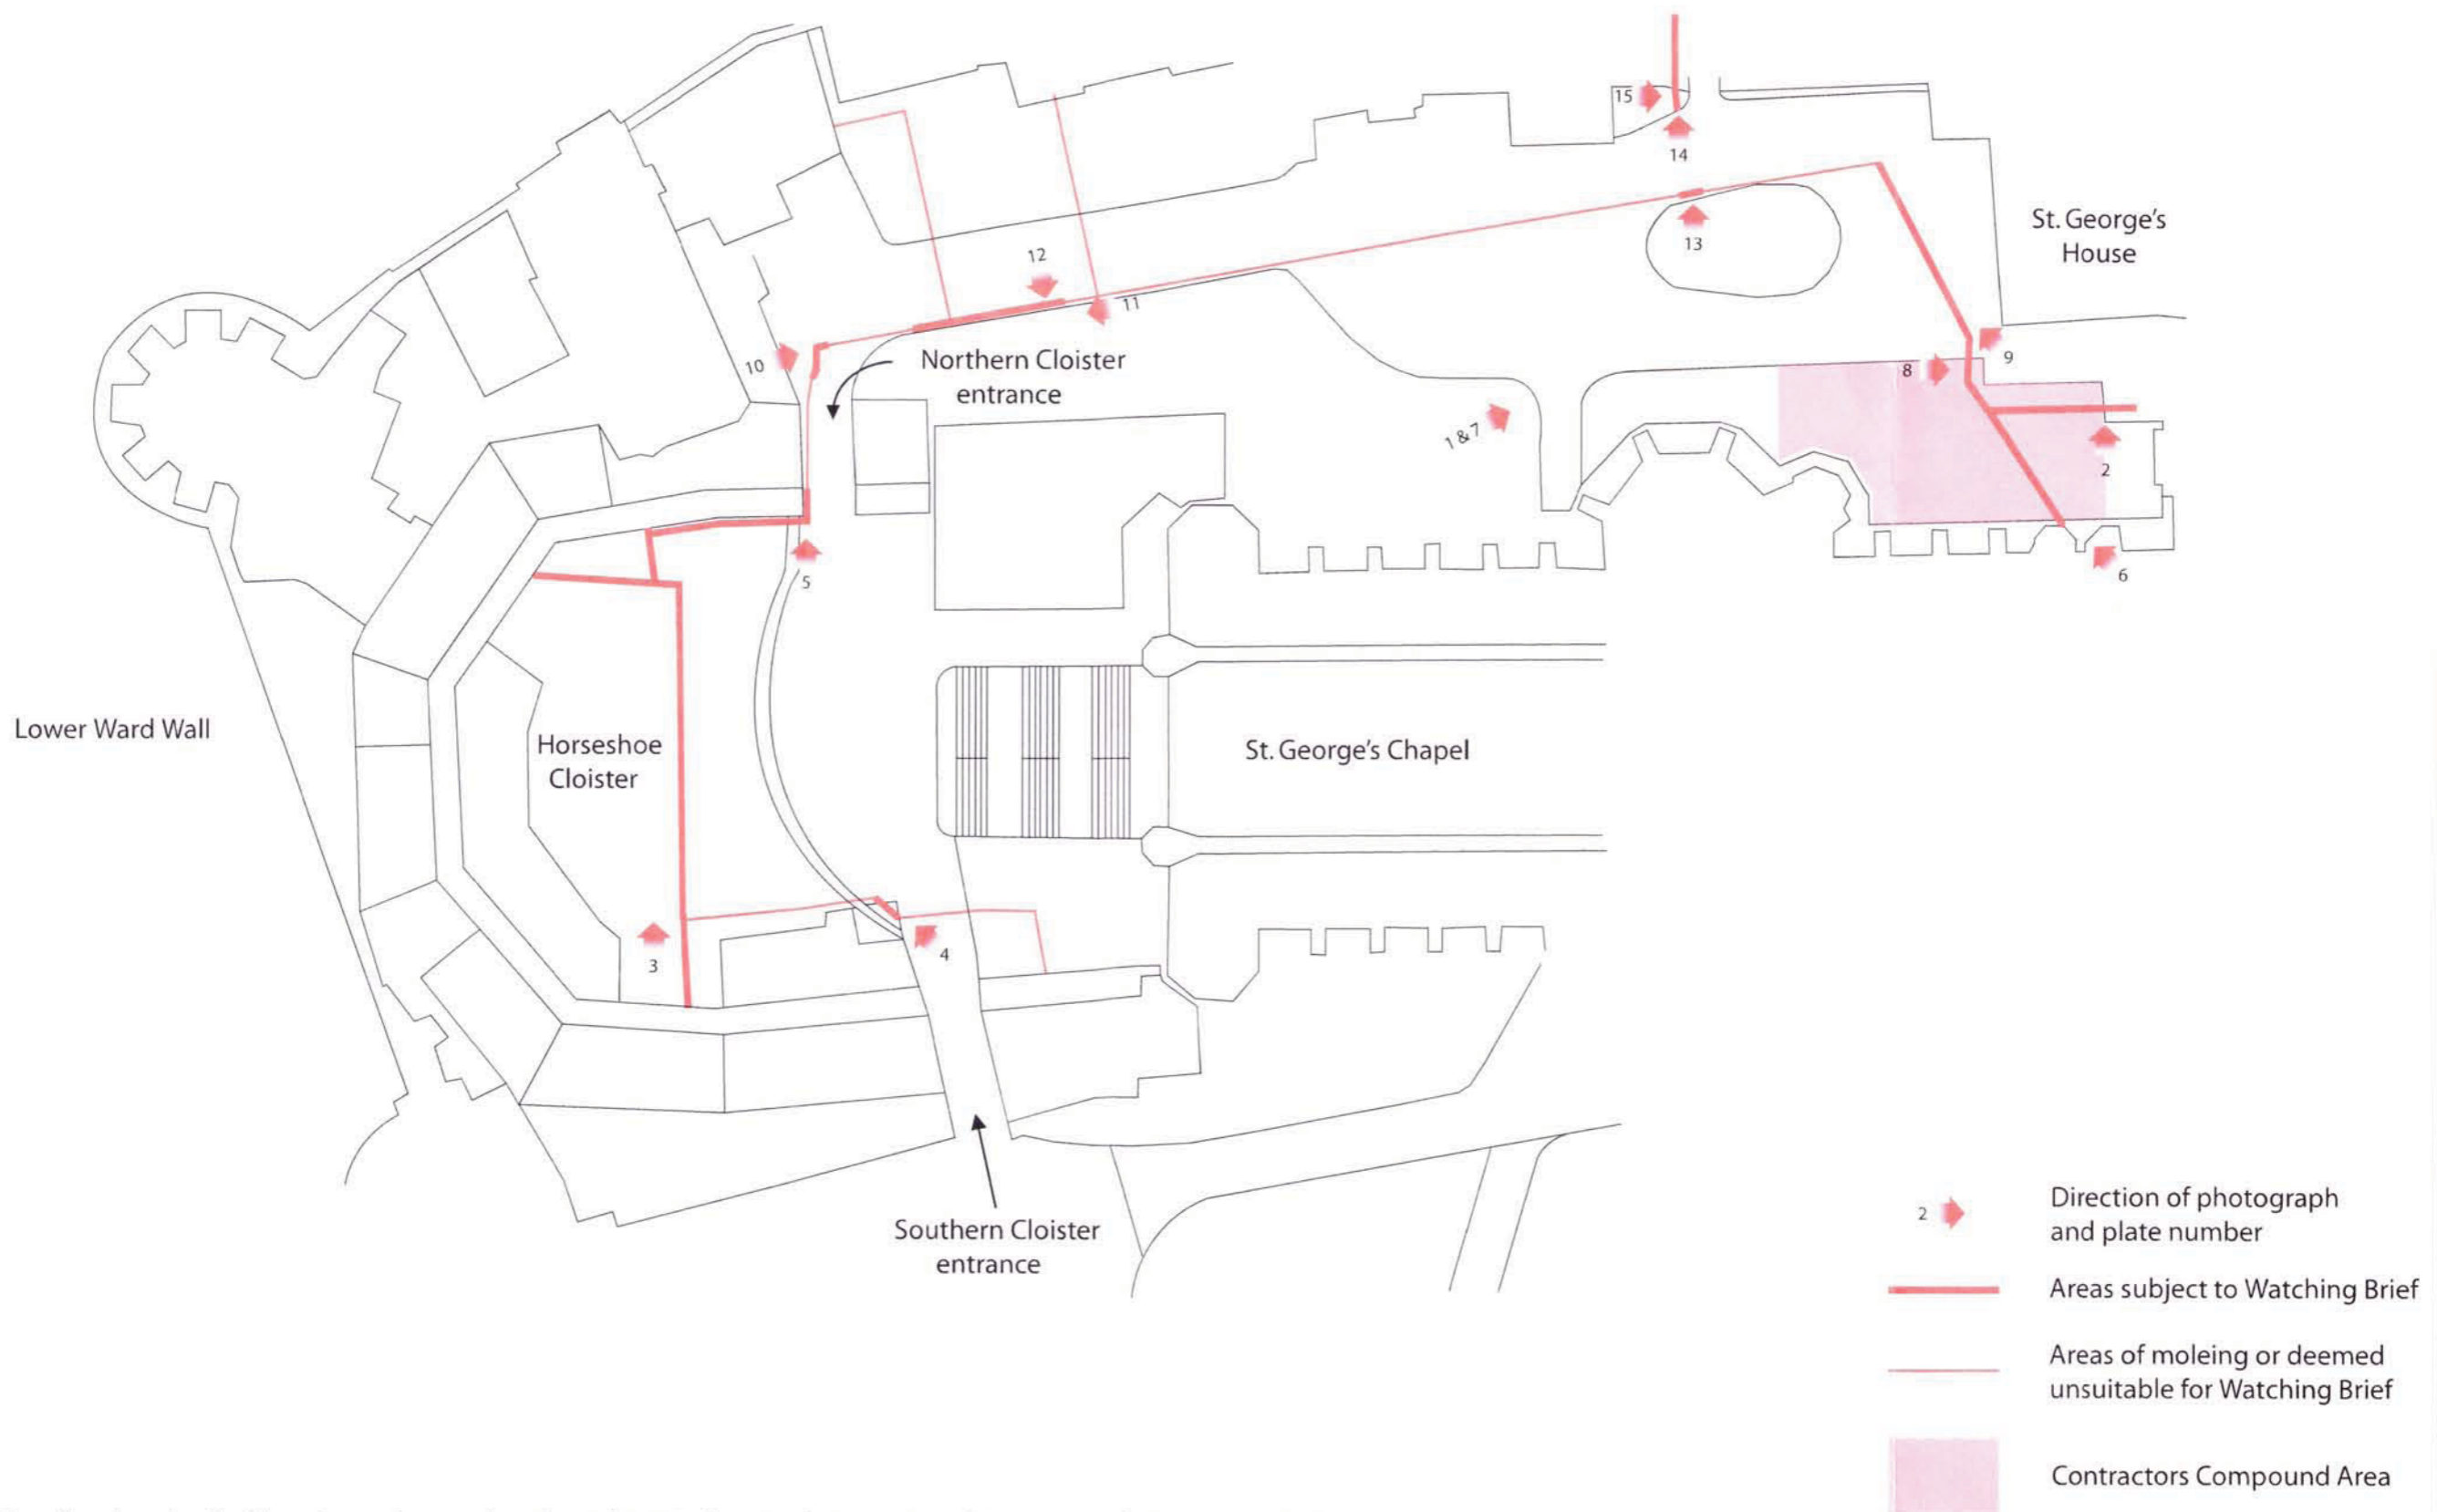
Plan showing detailed locations of groundworks within Windsor Castle Lower Ward (Do Not Scale From Drawing)
